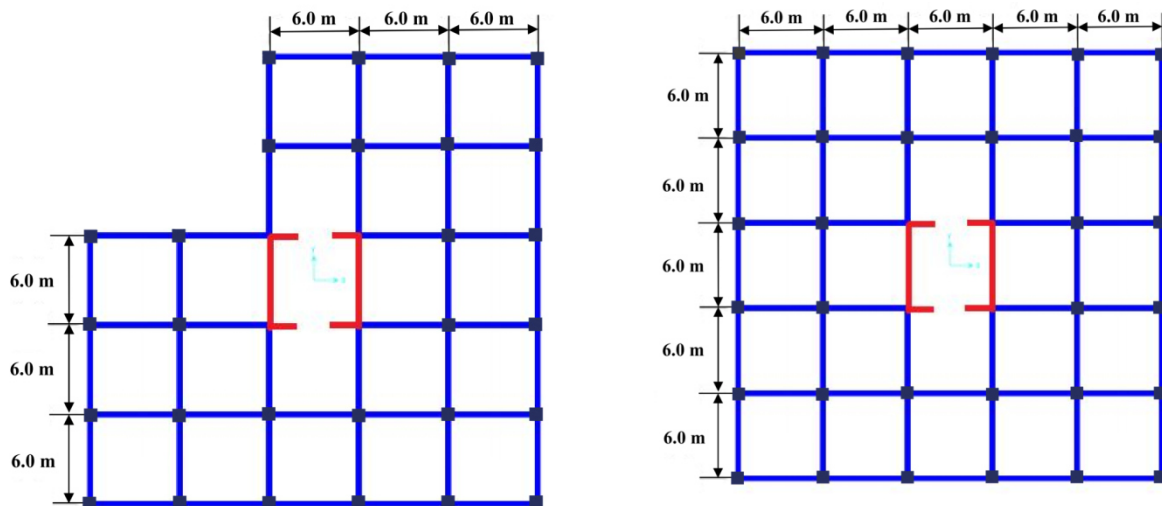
Typical floor plan of the symmetrical and unsymmetrical buildings
